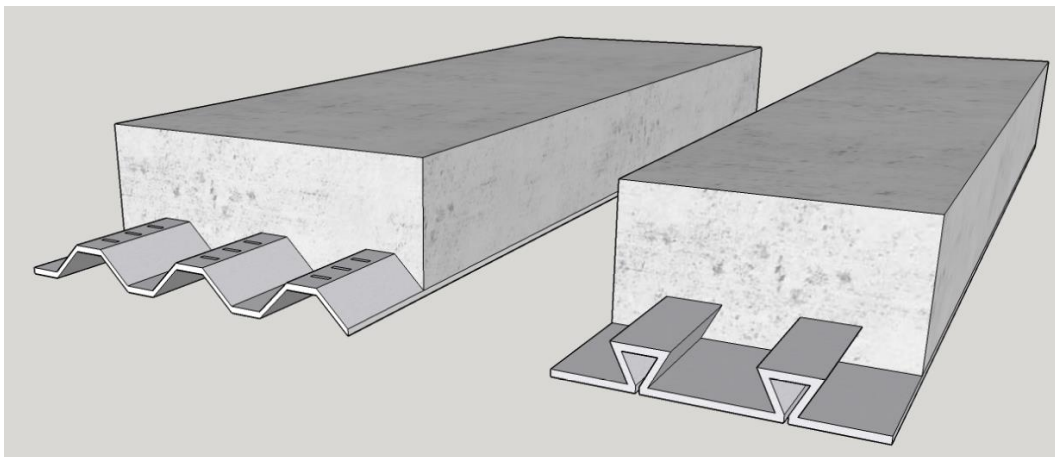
Composite slab steel profiles; trapezoidal (left) and dove-tail (right).
